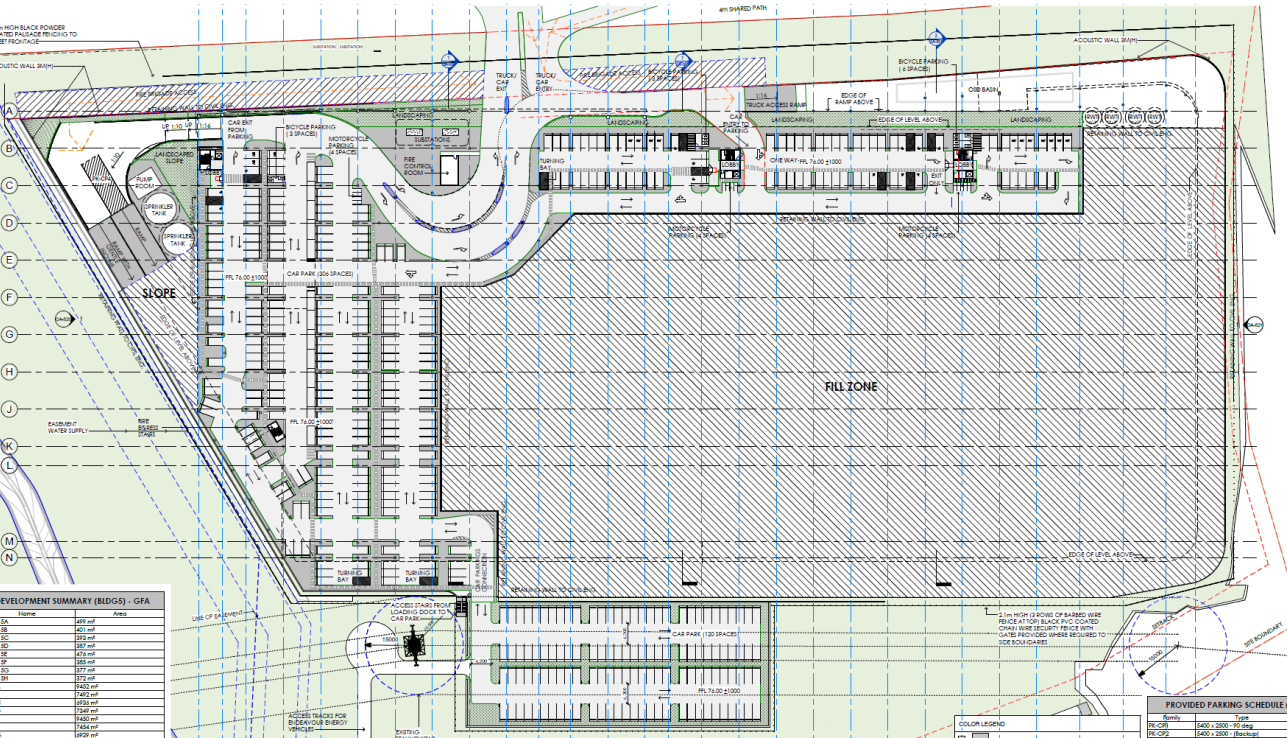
Lower Ground Floor Plan (car park and office entry lobbies)
